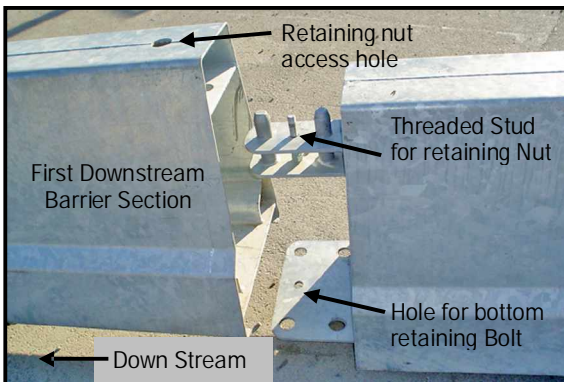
Lower the holes in the female end over the pins and retaining bolt on the End Section.
